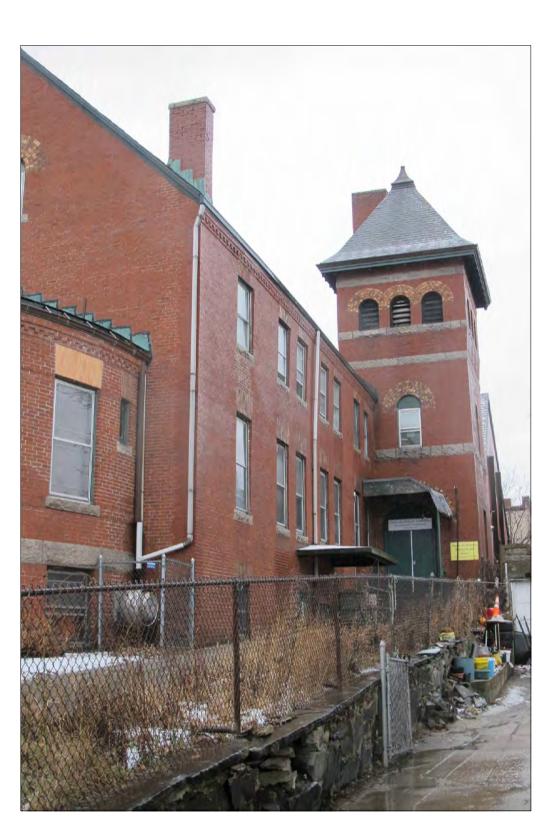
Existing area between Somerville Hispanic Church and neighbor's property. Note: new walkway and accessible entrance to be built at this location.
